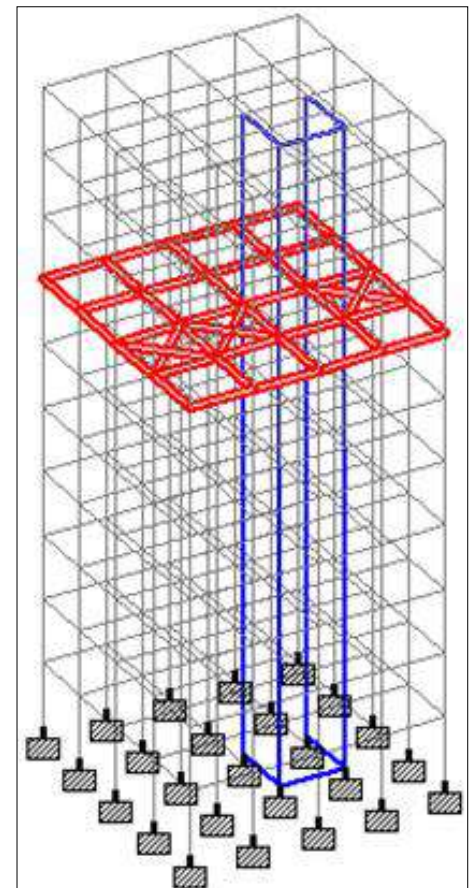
Model-VI: Outrigger (bracings) at sixth floor with core wall (EQ-5)
